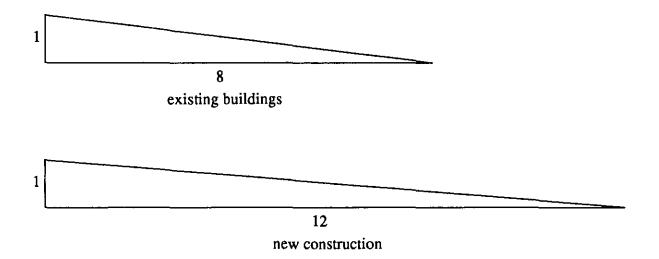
Maximum recommended ramp slopes for use in existing buildings and in new construction. (American National Standards ANSI A117.1-1986).
